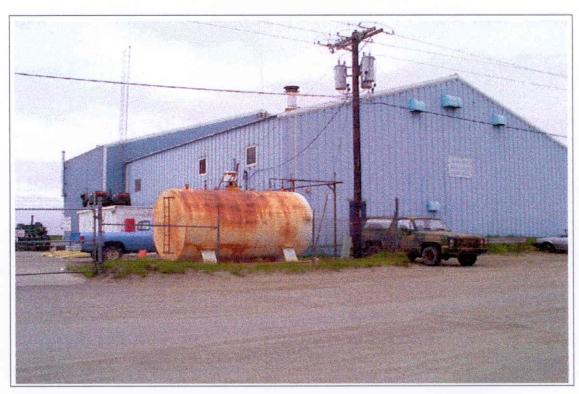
The eastern corner of the Bethel AAOF (facing west).
